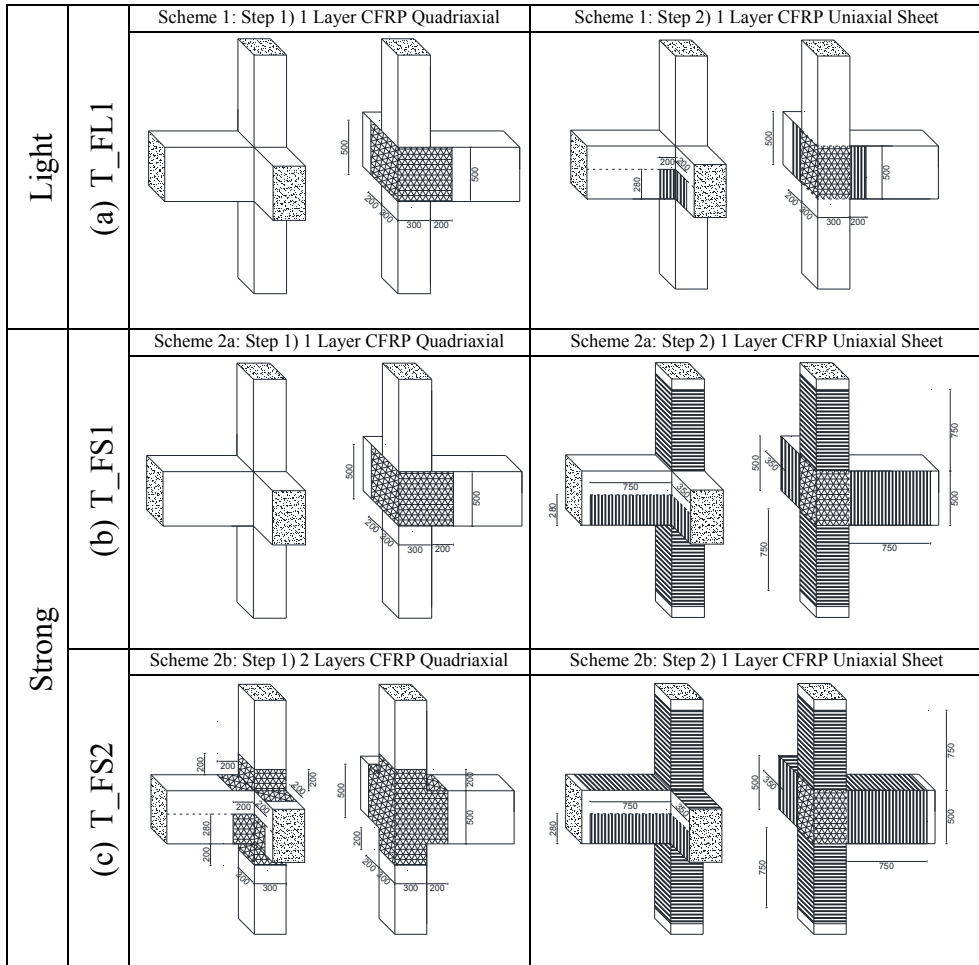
FRP strengthening layouts (dimensions in mm).
